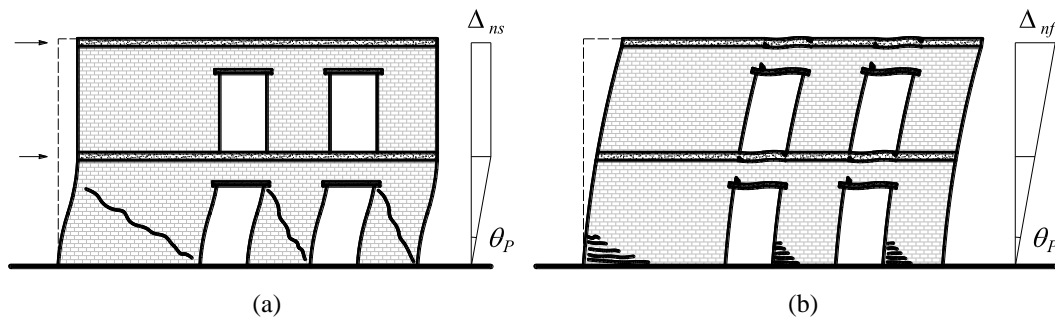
Lateral displacement profile in relation to the expected failure mode of piers in a load-bearing masonry wall with openings: (a) piers failing in shear; (b) piers failing in flexure.
